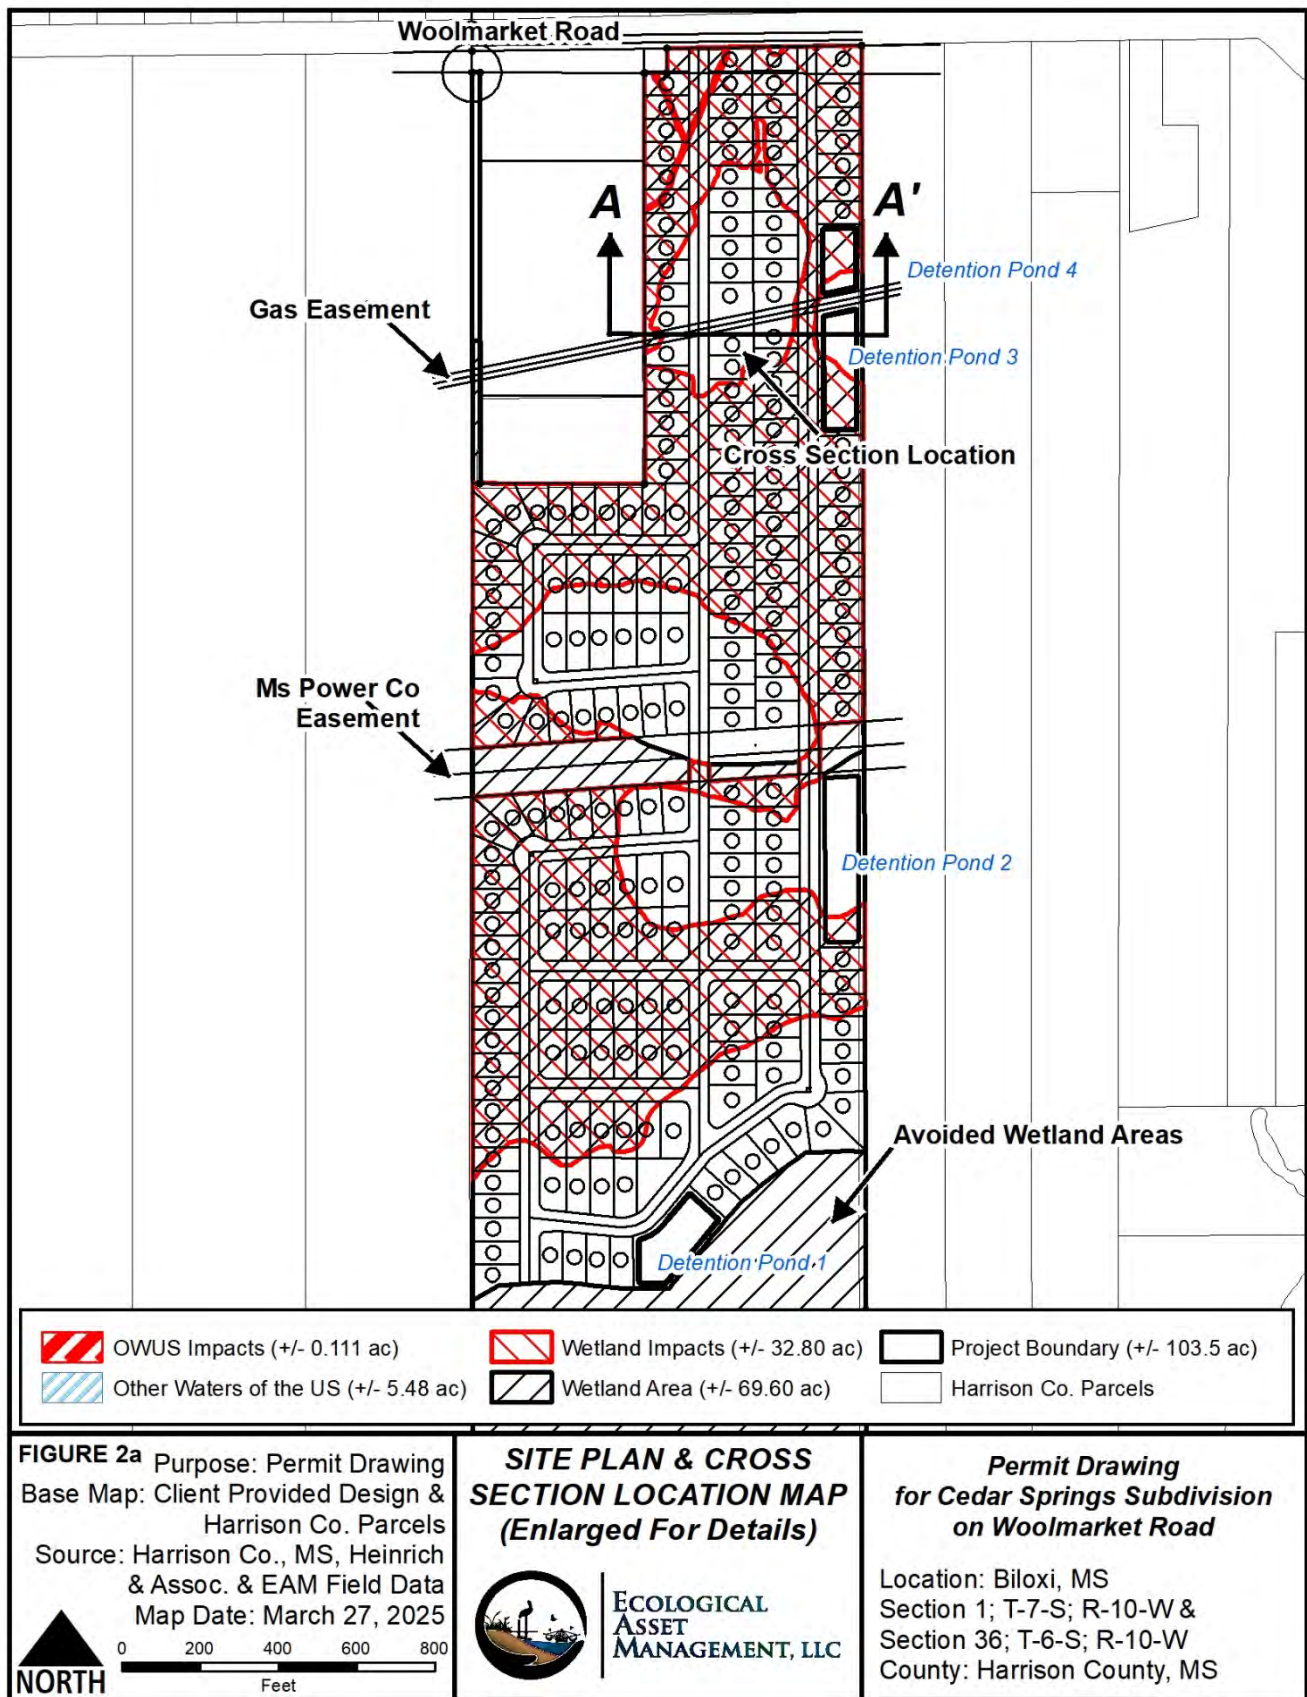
Cedar Springs Subdivision Site Plan & Cross Section Location Map - Enlarged
